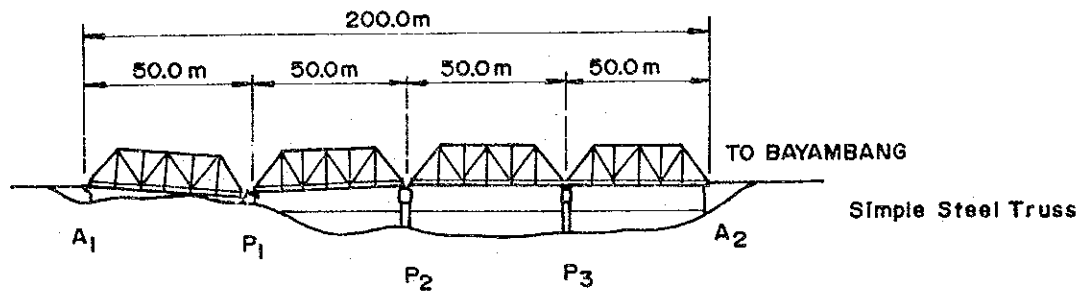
SKETCH OF DAMAGED SISON BRIDGE
